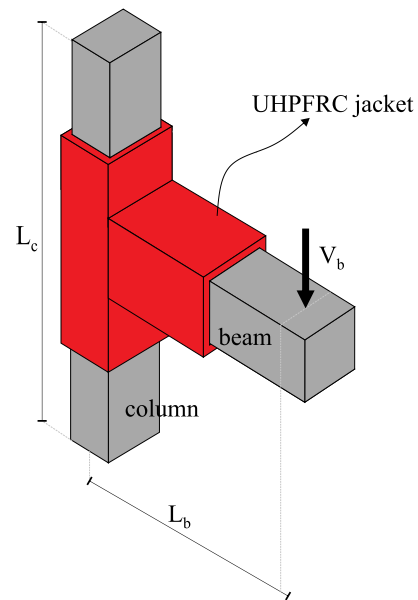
Scheme of exterior beam–column joint retrofitted with UHPFRC.
